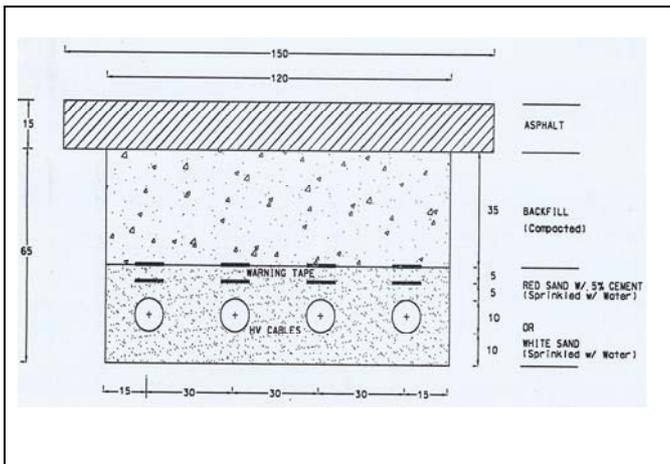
Details Measurements and Bedding Material for Trench with three or four cables:
